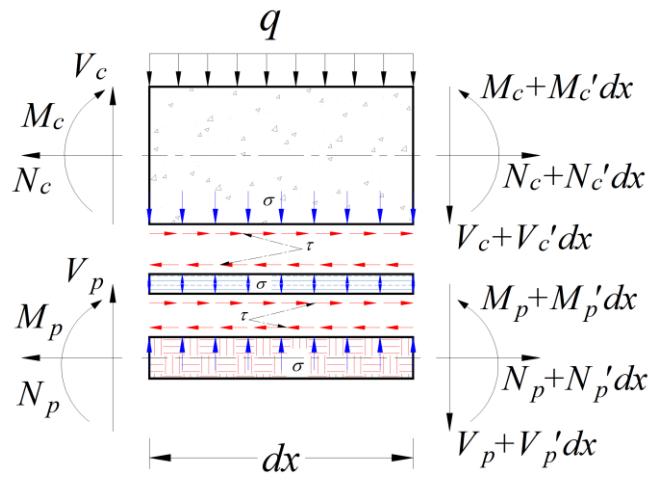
Differential element in concrete beams externally bonded FRP laminates with adhesive
